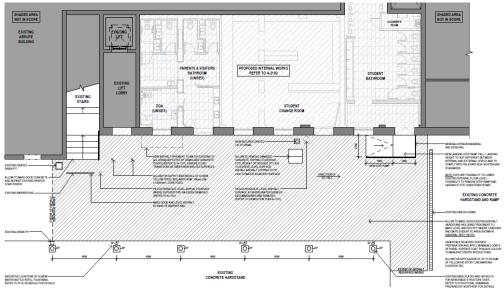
Proposed External Works Plan. (Source: RFA Architects)
